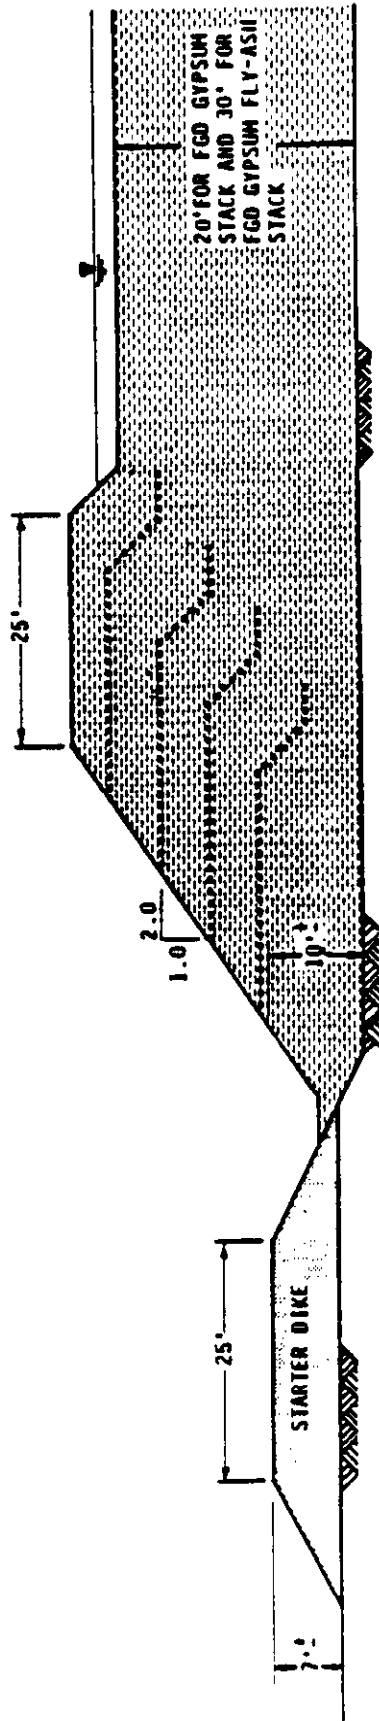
Conceptual Cross Section of Proposed EGD and FGD Gypsum-Fly Ash Stacks
